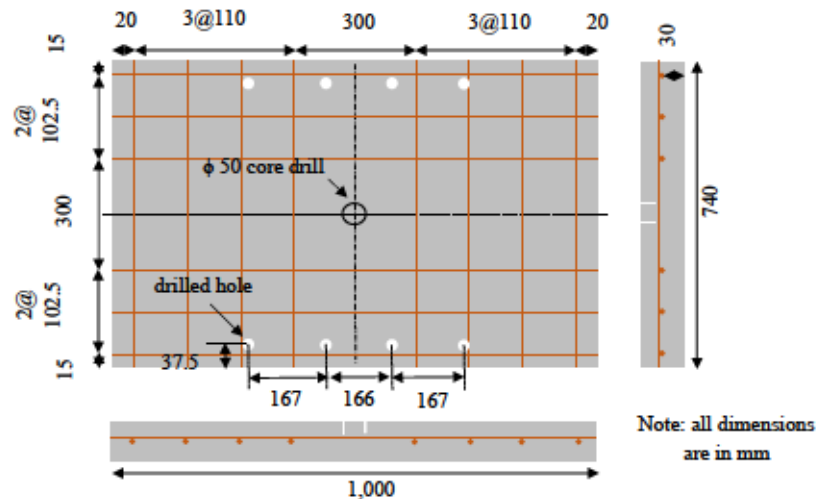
Details of steel fiber reinforced PCM slab [2]
